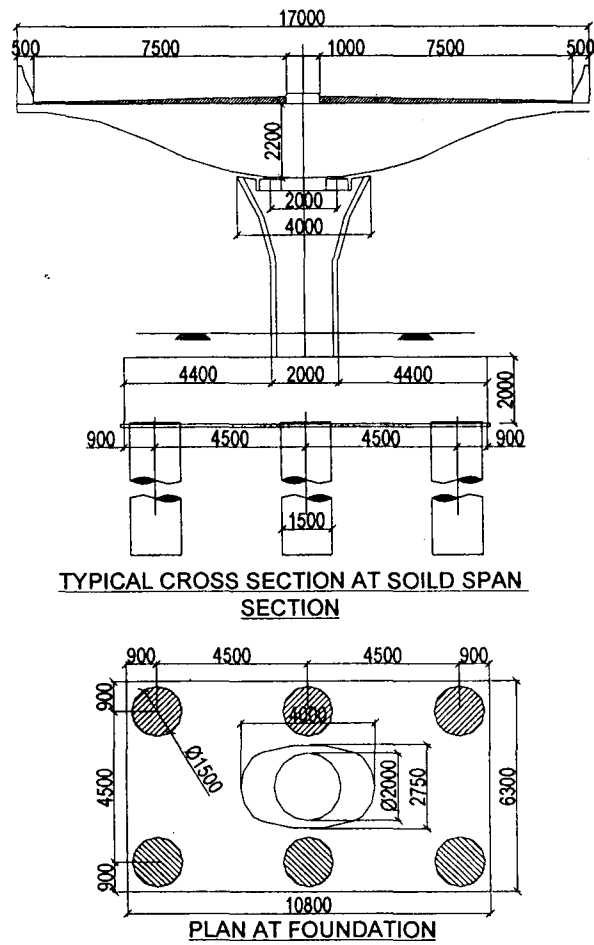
Typical cross section of elliptical pier (double) and pile foundation
